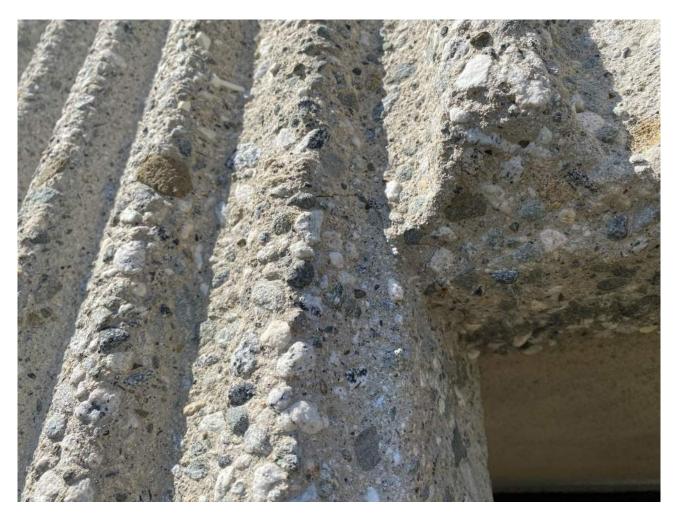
MINOR CRACKING IN CONCRETE TILT-UP LINTEL TO WALL
